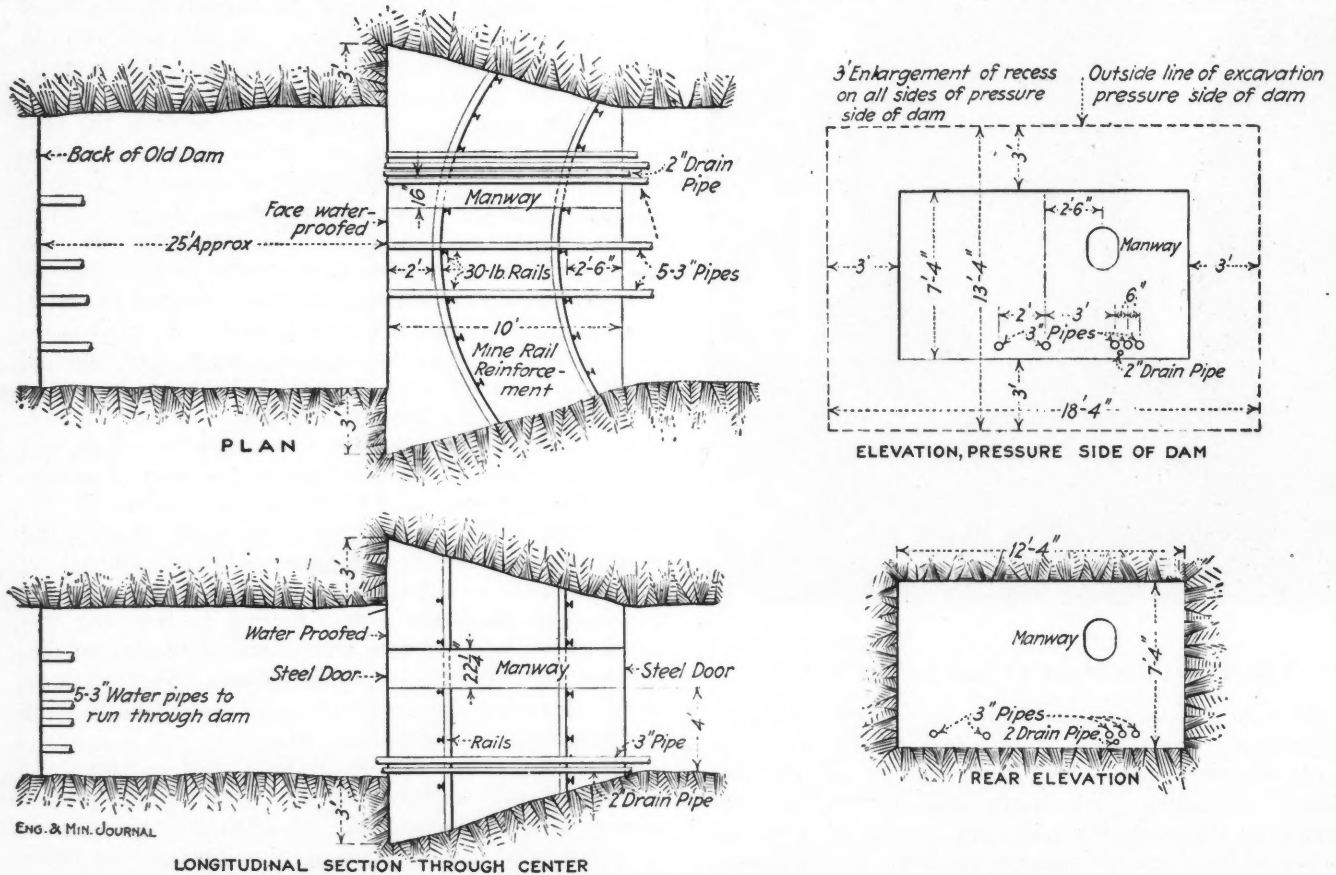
PLAN AND LONGITUDINAL SECTION AND END ELEVATIONS
